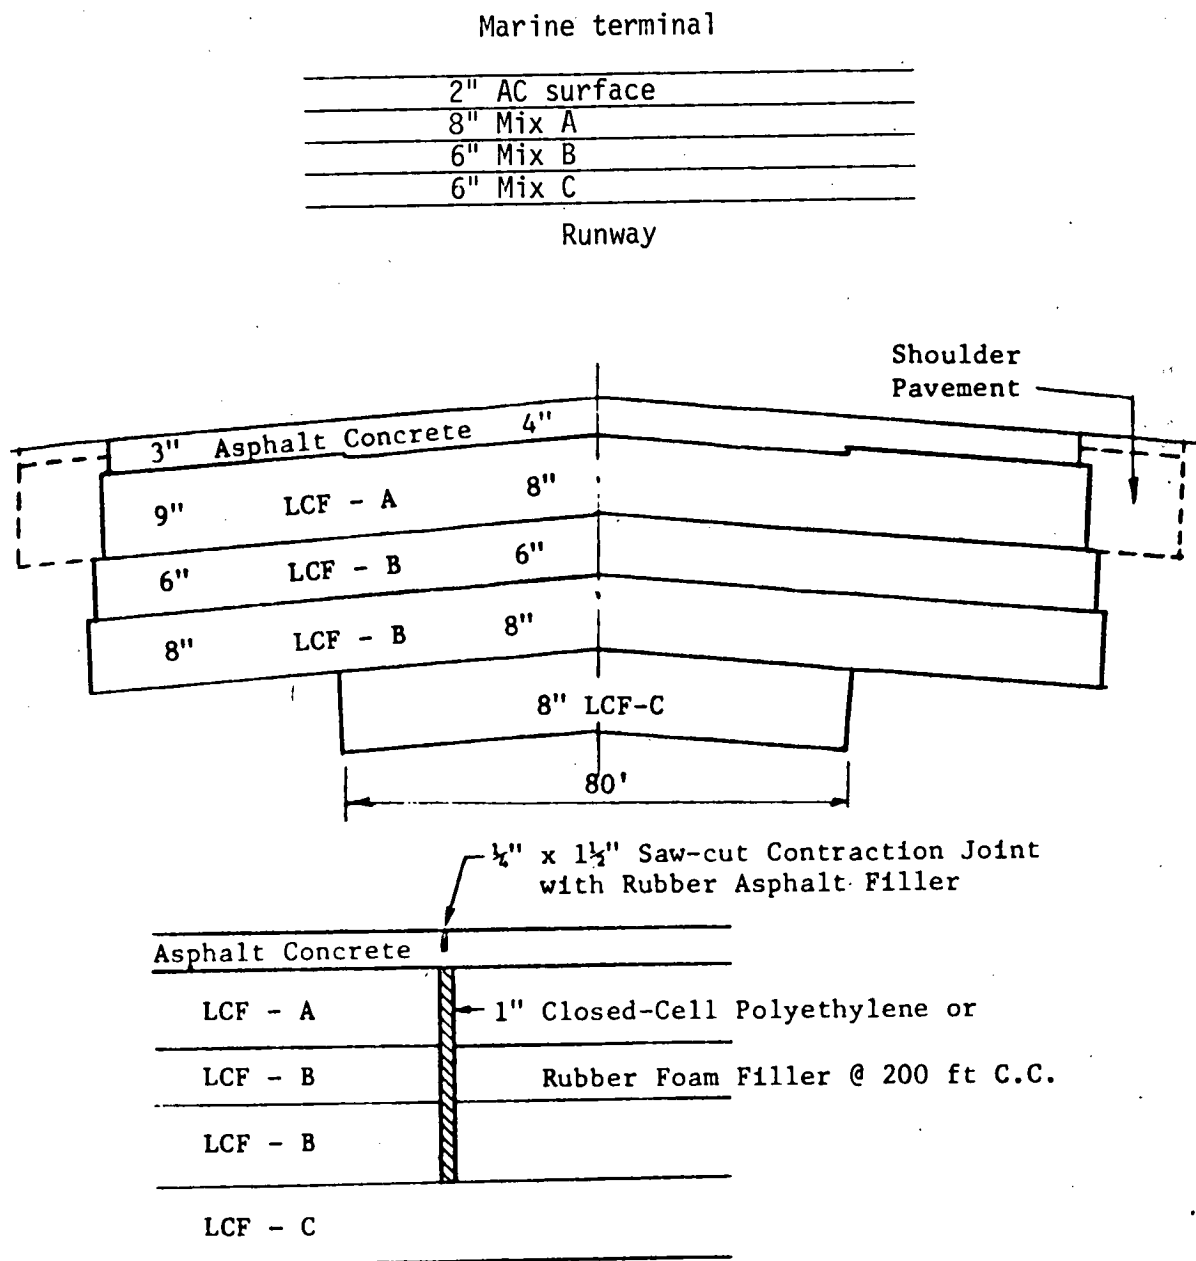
Typical cross sections used in the LFA heavy-duty pavements at Portland, Ore., for the marine terminal and airport.
